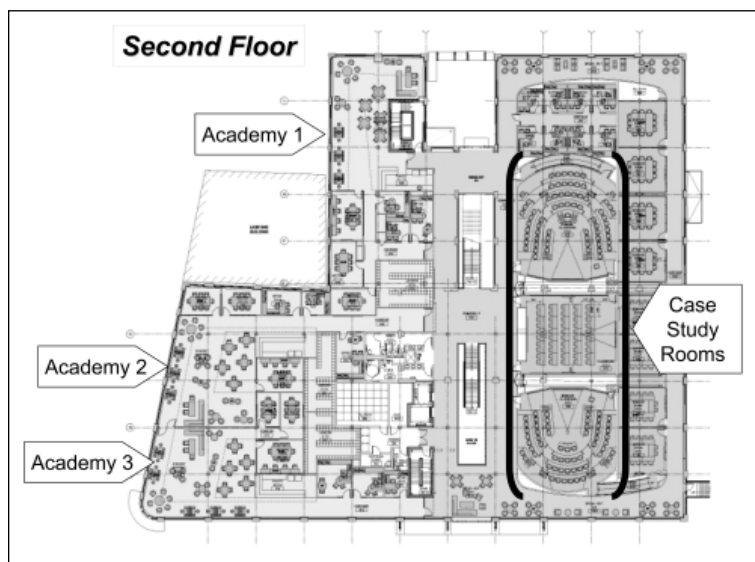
The floor plan for the second floor of the new facility. The atrium continues from the first floor to the second floor.
